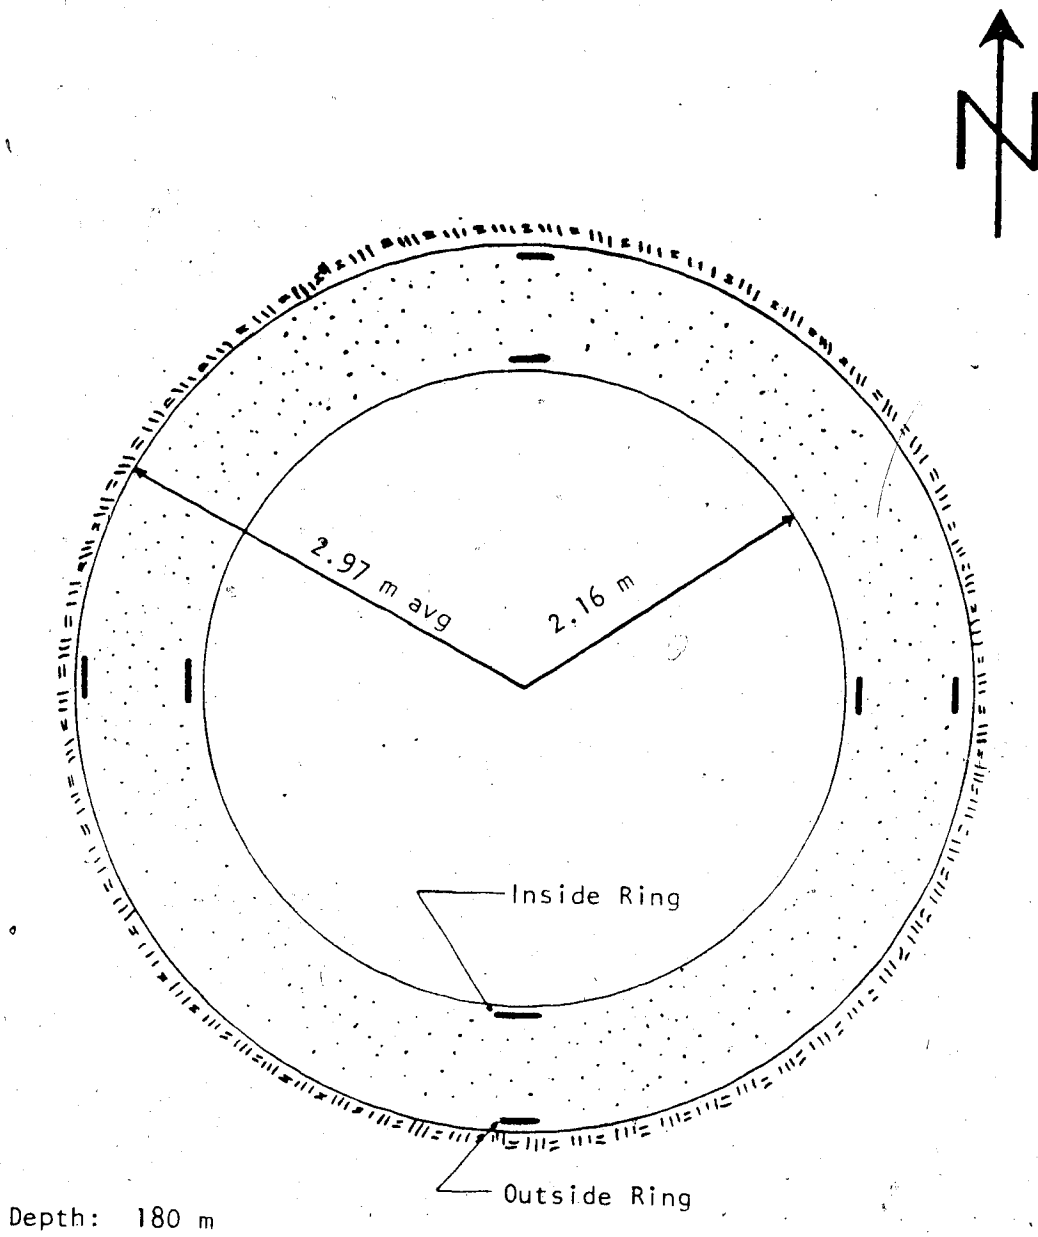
Plan View of Embedment Gauges at 180 m Depth
